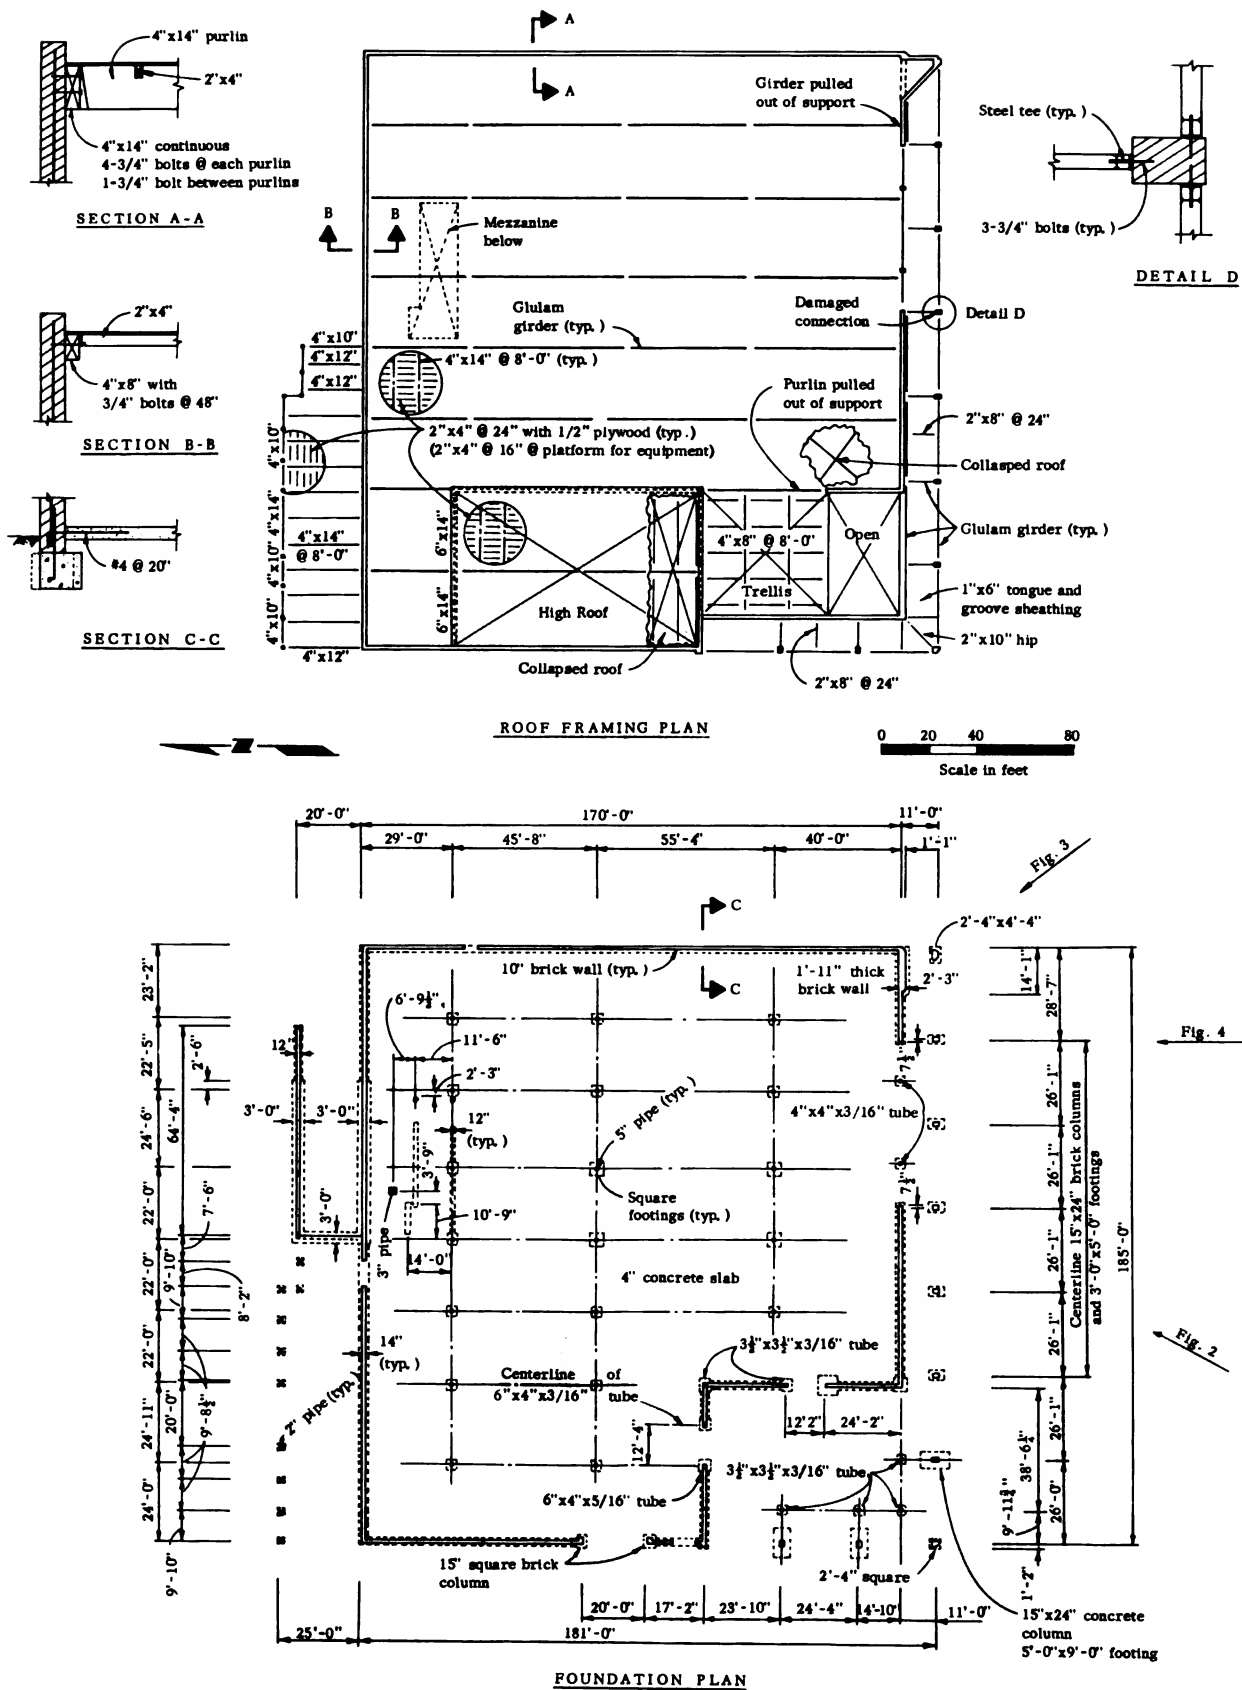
Builder's Emporium. Roof framing and foundation plan.
